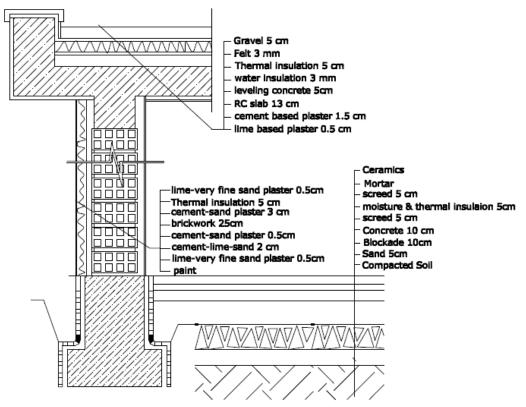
Construction Technique in Contemporary period- Brick wall – C_{15}
